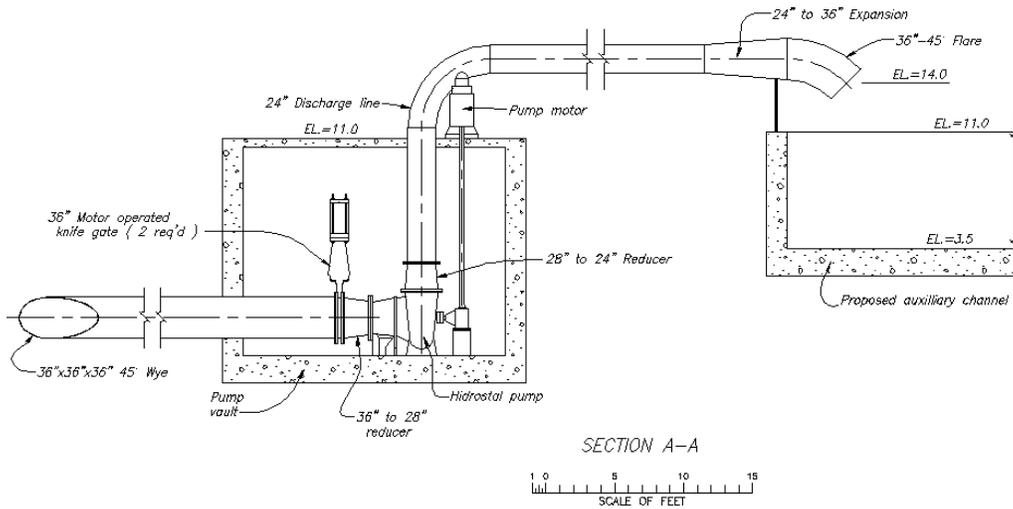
Section view of pump vaults and discharge piping into new secondary
